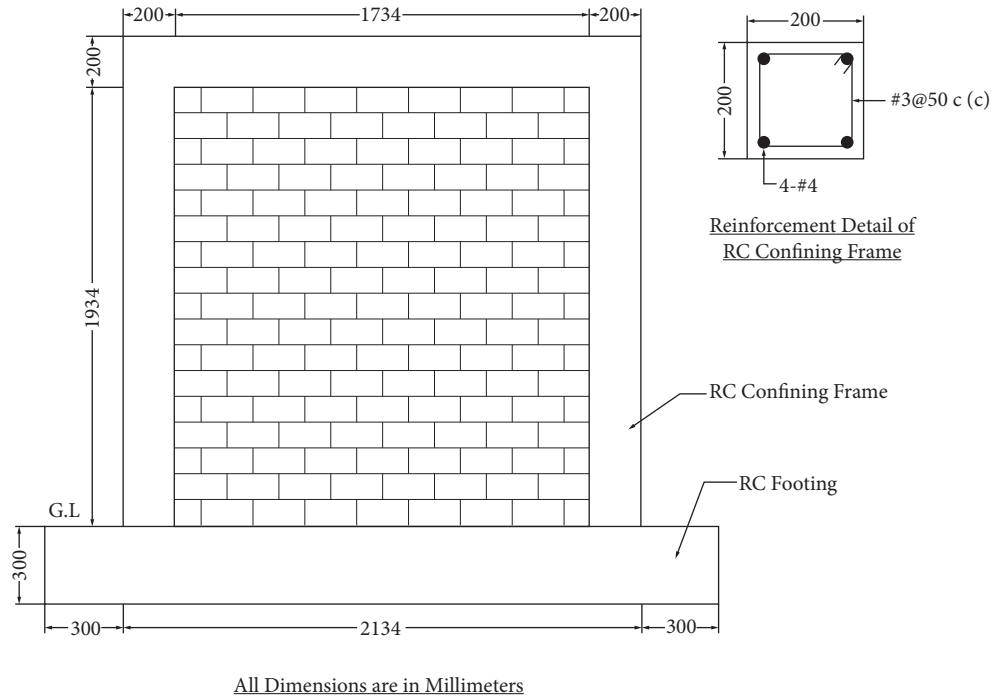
Geometric description of test model wall with dimensions and reinforcement detail of RC confining frame.
